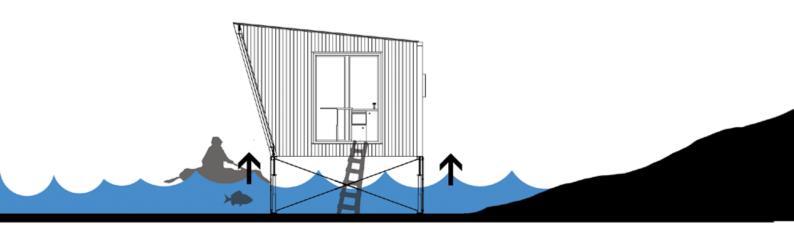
36. South elevation with 1500mm high foundations at 1:100
